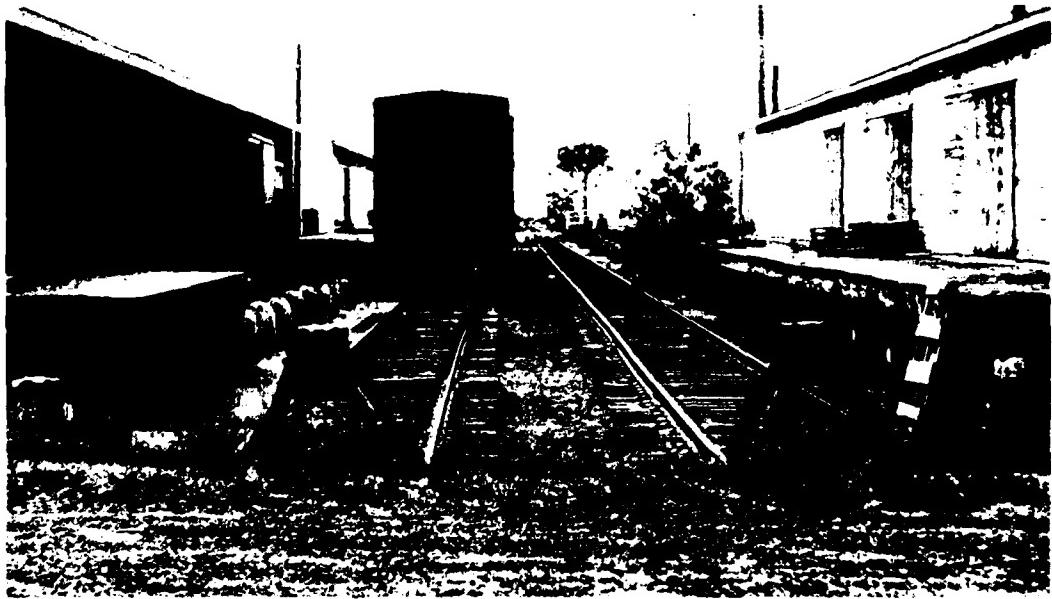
Tracks 28 (left) and 27 (right) (looking southwest).
